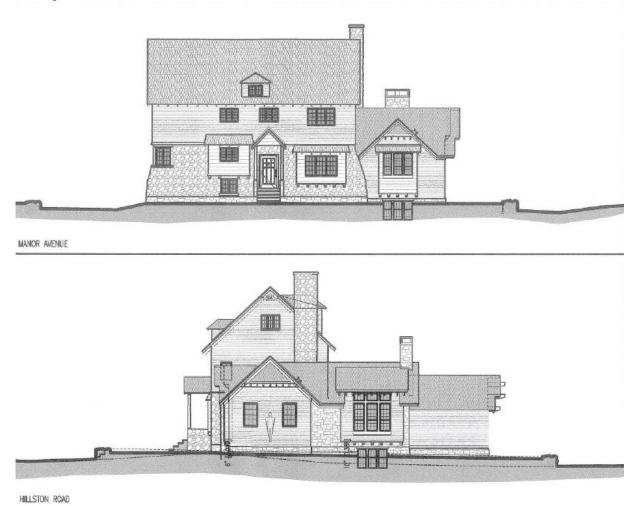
Elevations – west Manor Avenue, and south – Hillcrest Avenue of the proposed addition. Source: 2022 revised Building Permit Set Arc Associates Inc.
